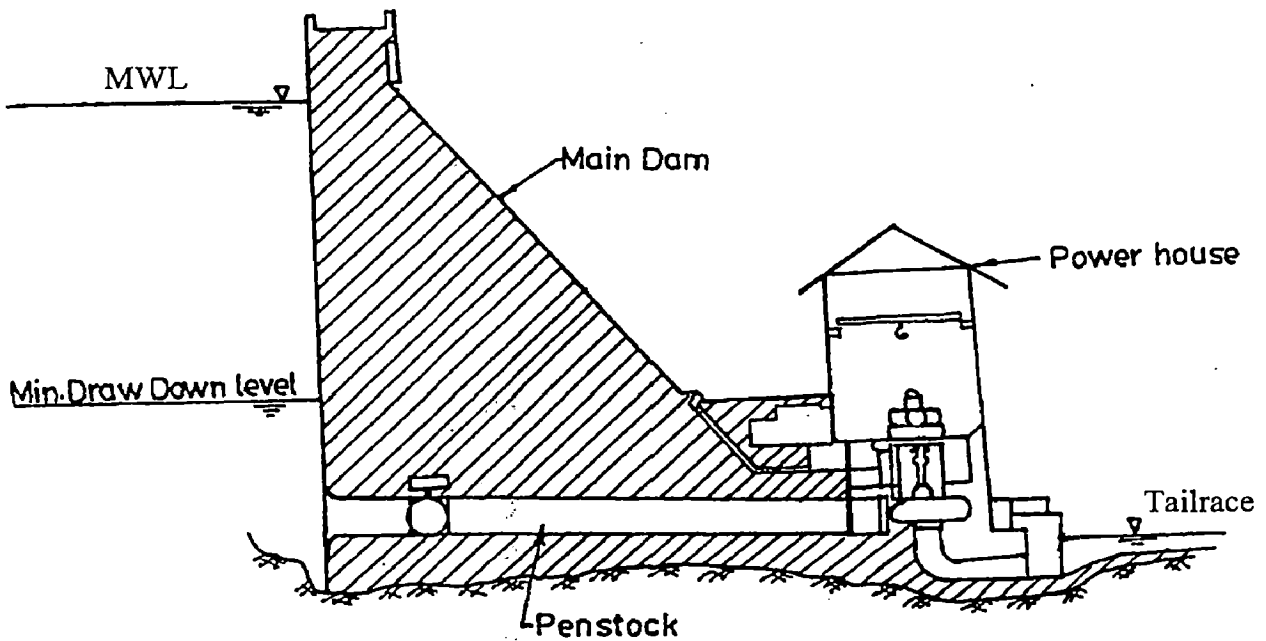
TYPICAL LAYOUT OF DAM TOE SHP SCHEME
